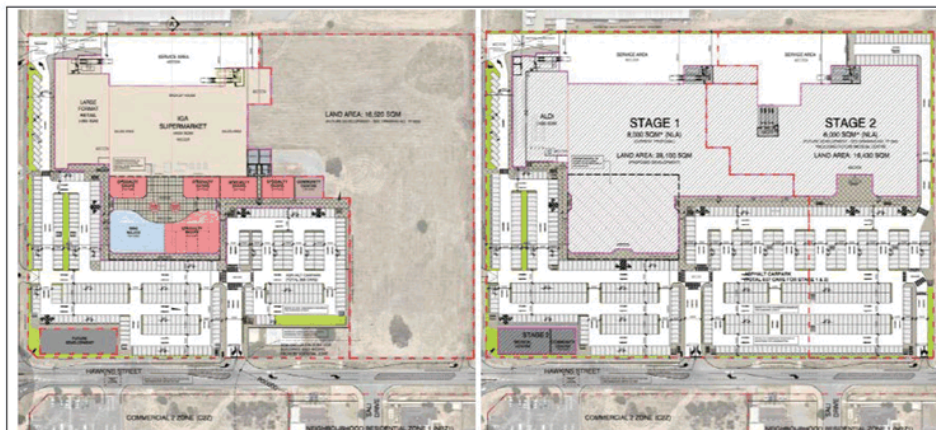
Revised plans for the IGA redevelopment Stage 1 (left) and proposed Stage 2 (right) plans, submitted January 2017.
